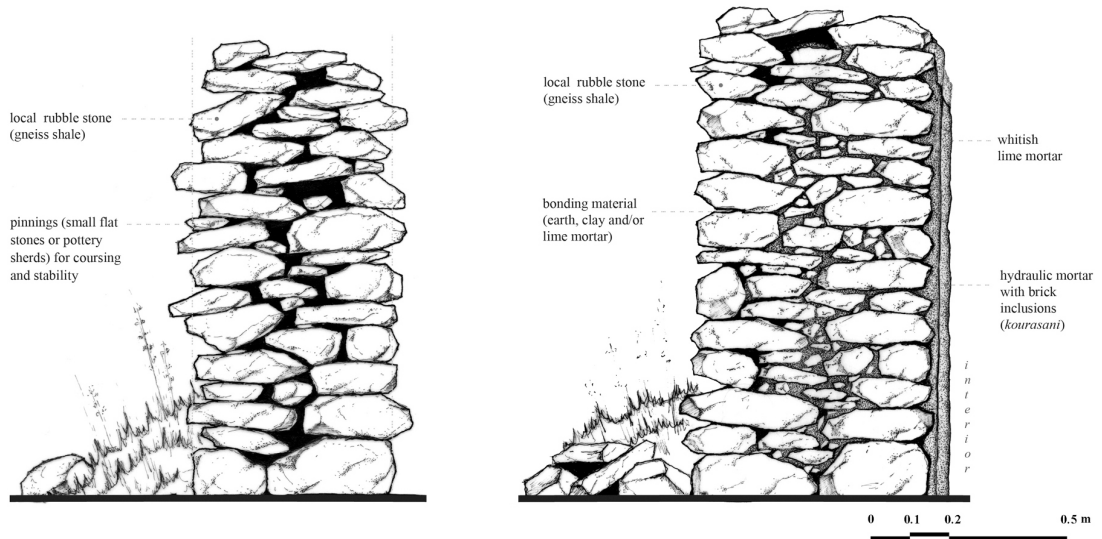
Drystone wall (left) and bonded cistern wall (right) (C. Veloudaki)
